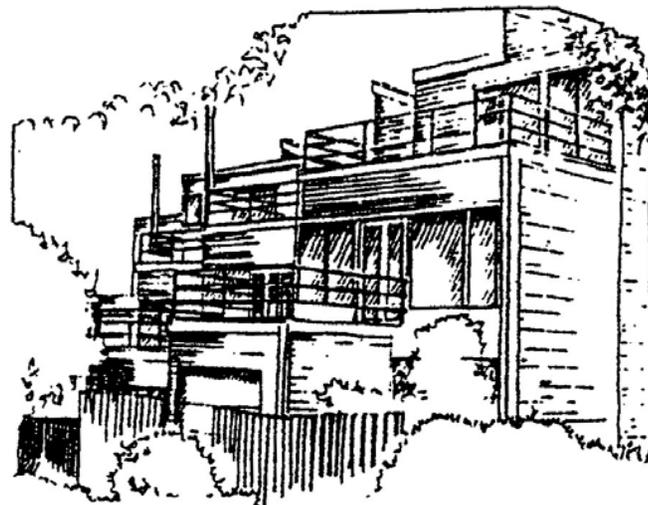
These contemporary looking houses have well detailed horizontal wood siding.
